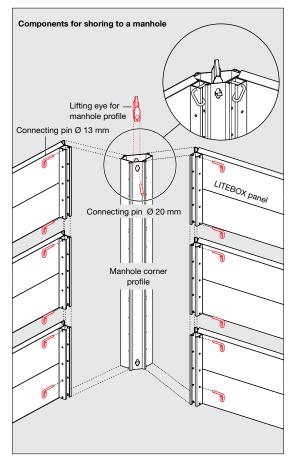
| Overview of construction principles for shoring to trenches and manholes
